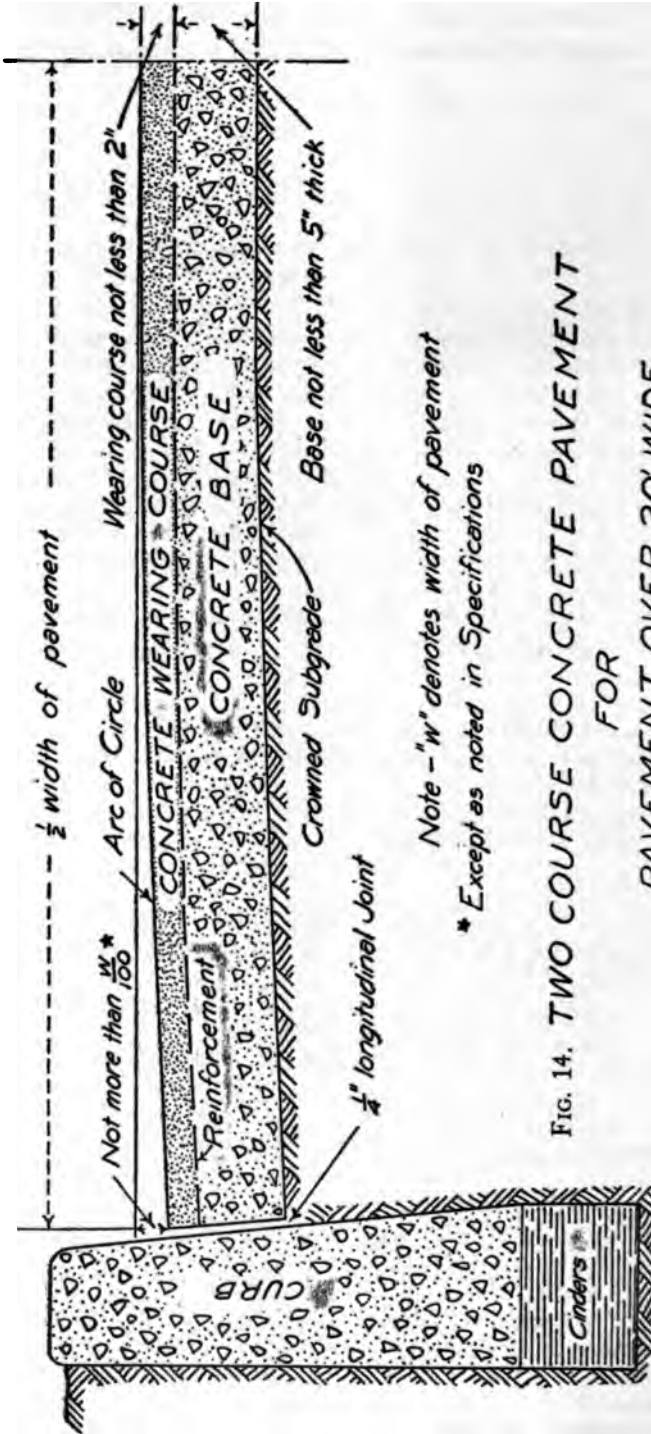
TWO COURSE CONCRETE PAVEMENT
